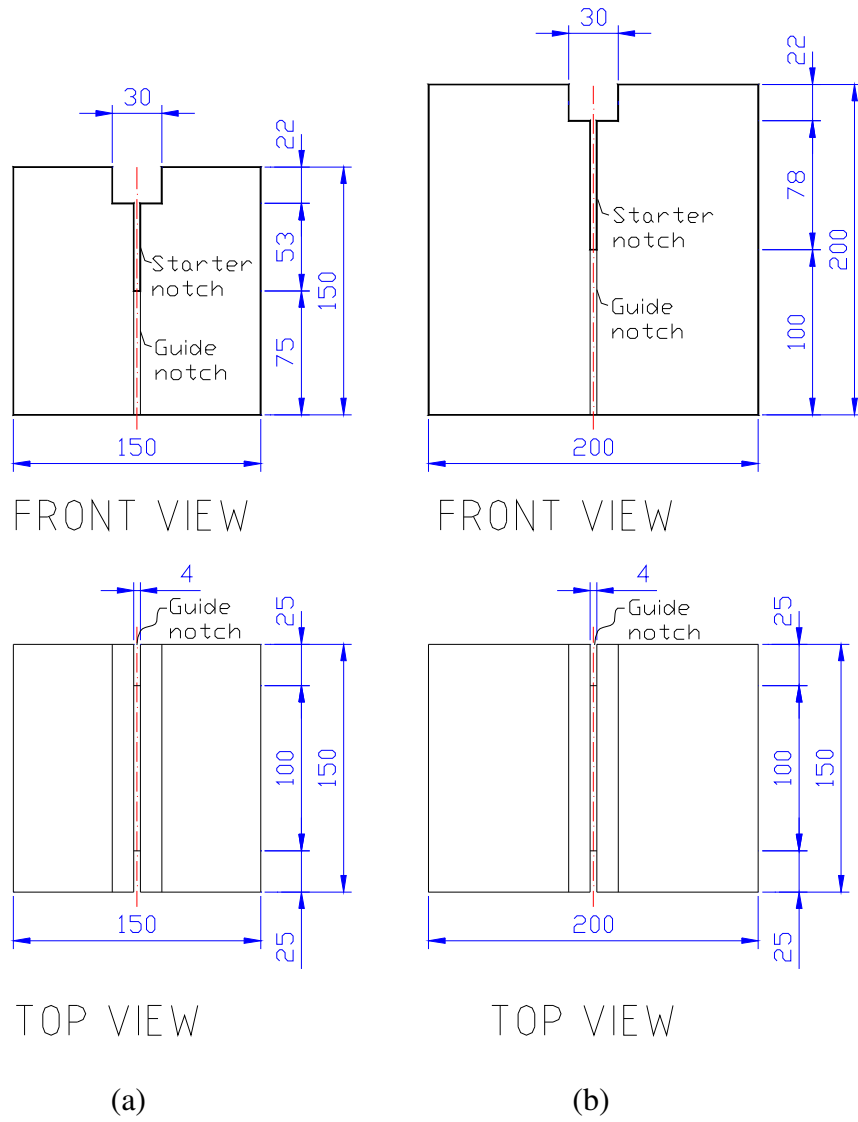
Specimen geometries: (a) $150 \times 150 \text{ mm}^2$ specimens used for concrete Mix 1 (35 mm long fibres); and (b) $200 \times 200 \text{ mm}^2$ specimens used for concrete Mix 2 (60 mm long fibres).
